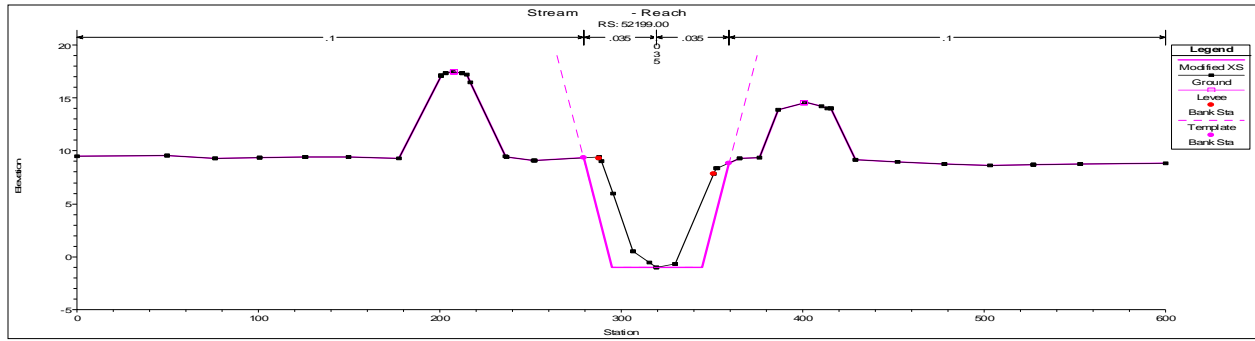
TYPICAL CROSS SECTION OF SCENARIO 4 IMPROVEMENT (ELEVATIONS IN NAVD)
